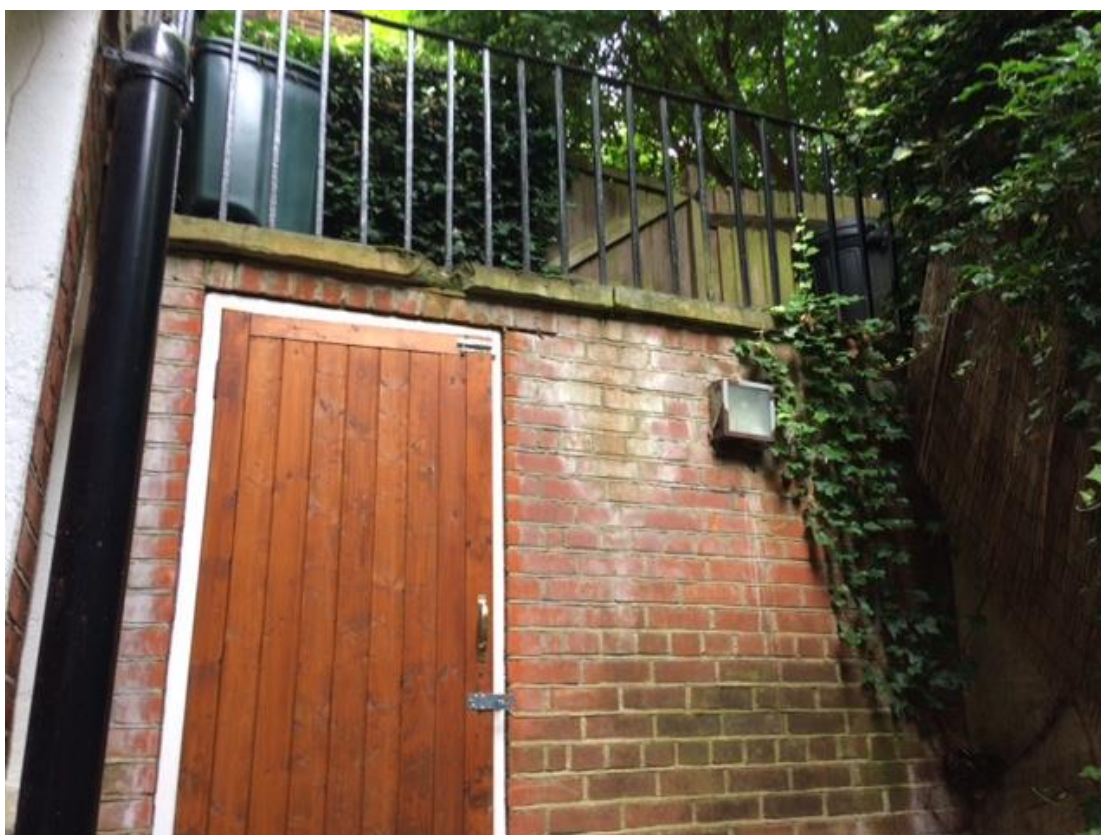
Side Elevation of Lower Ground Floor Lightwell - showing existing refuse storage building.
